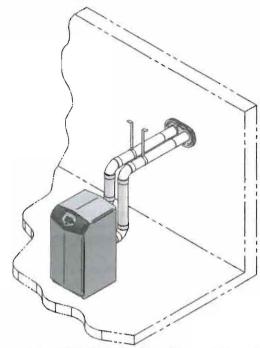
PVC/CPVC Two-Pipe Sidewall Termination - See page 21 for more details
